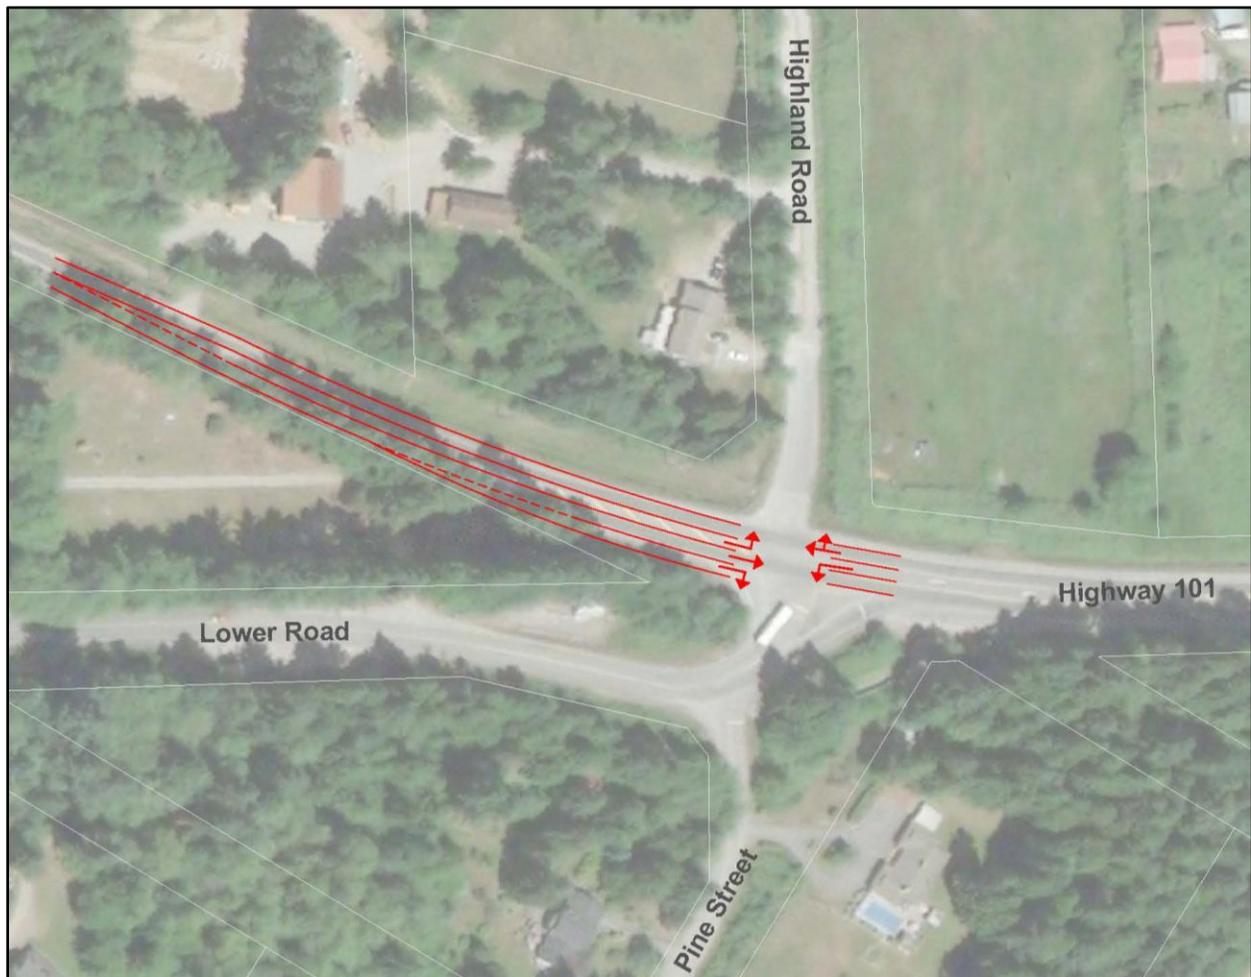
Proposed Improvements at the Highland Road Intersection
